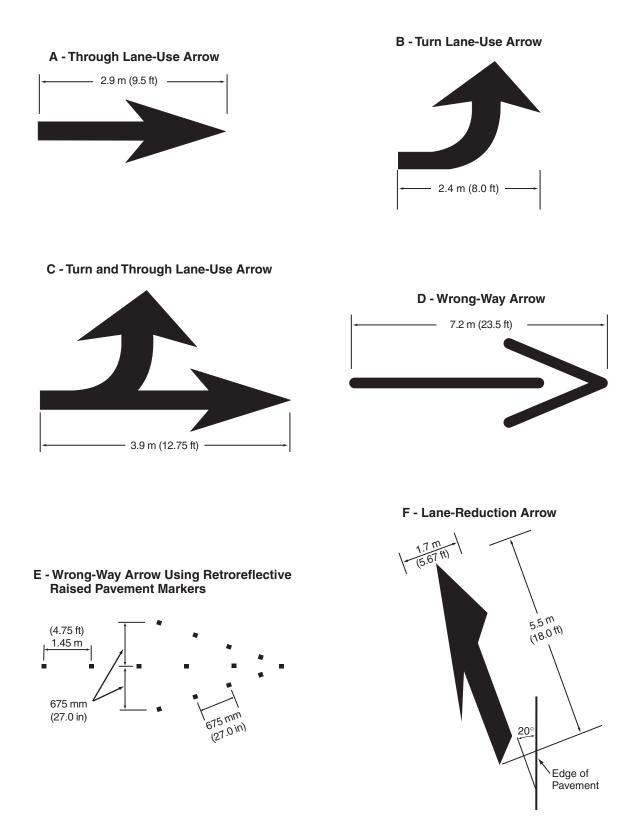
B-24. Examples of Standard Arrows for Pavement Markings
